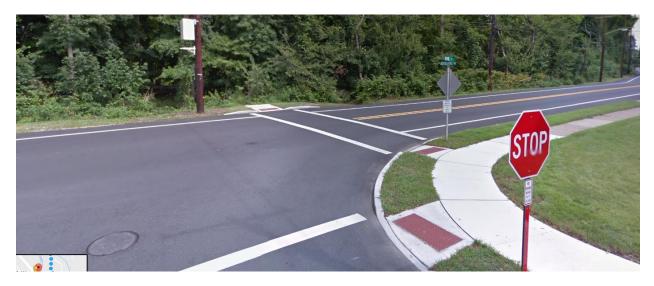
Grove Street Entrance with Crosswalk (Source: Google Maps)
